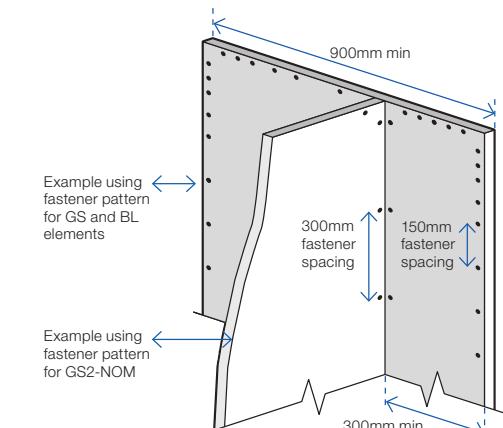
WALL INTERSECTION FASTENER PLACEMENT
